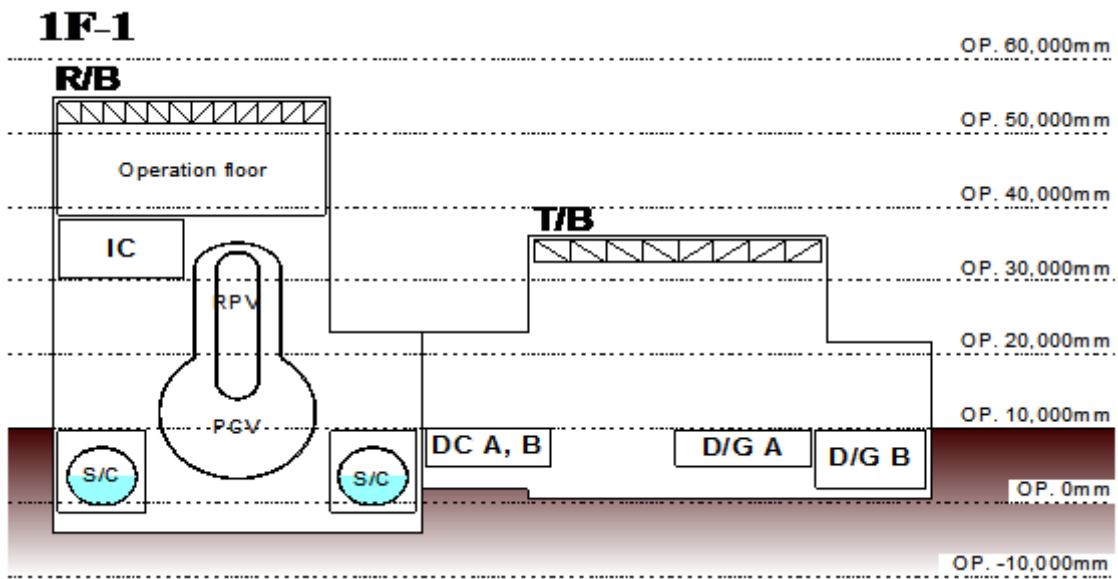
Building Cross-section for Unit 1, Fukushima Dai-ichi NPS
